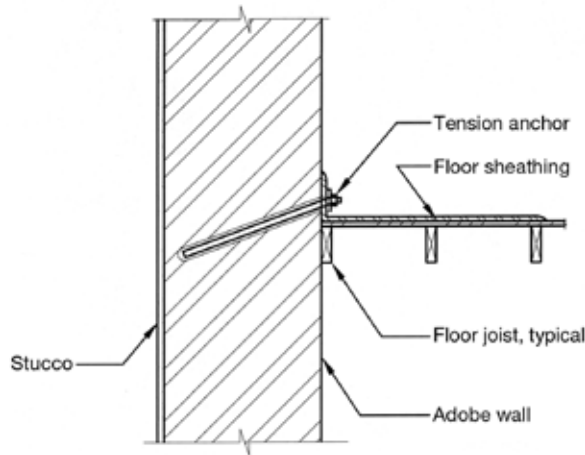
A tension anchor. Such anchors are typically not recommended for adobe buildings.
